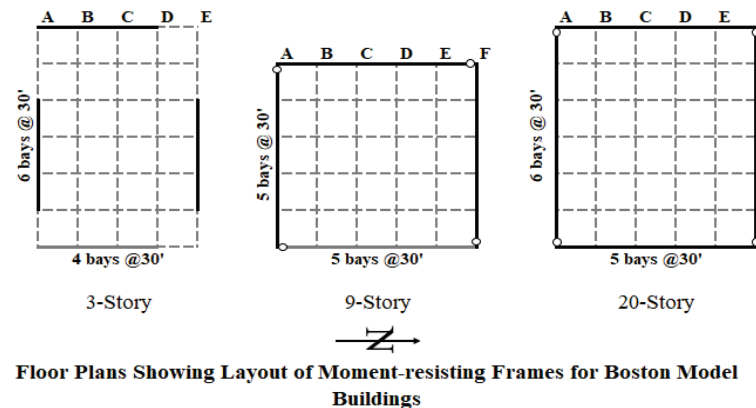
Baseline SDC B_{max} steel moment frame building plans.
